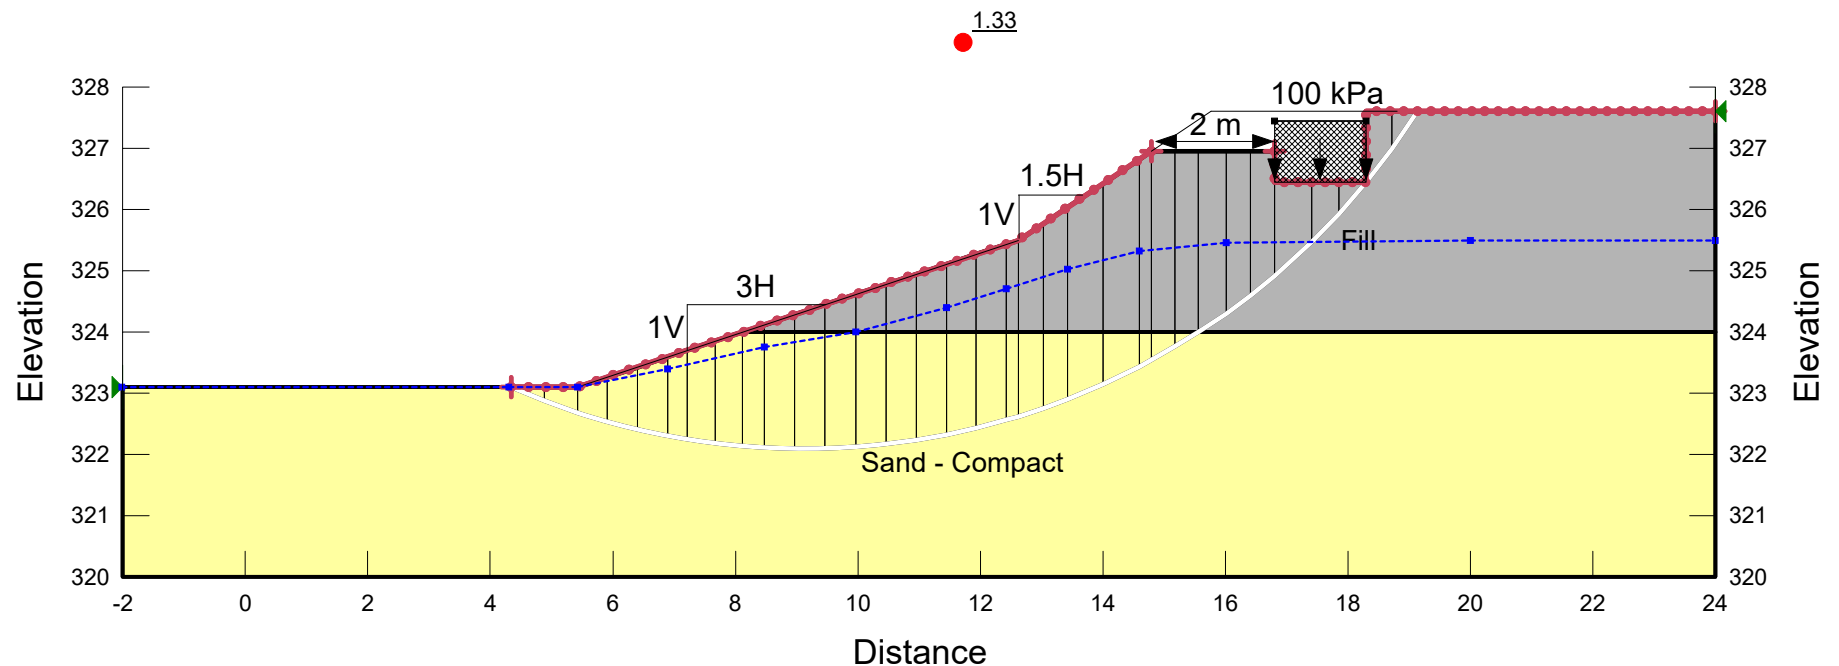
DUNC LAKE CULVERT EXCAVATION - EAST ABUTMENT
